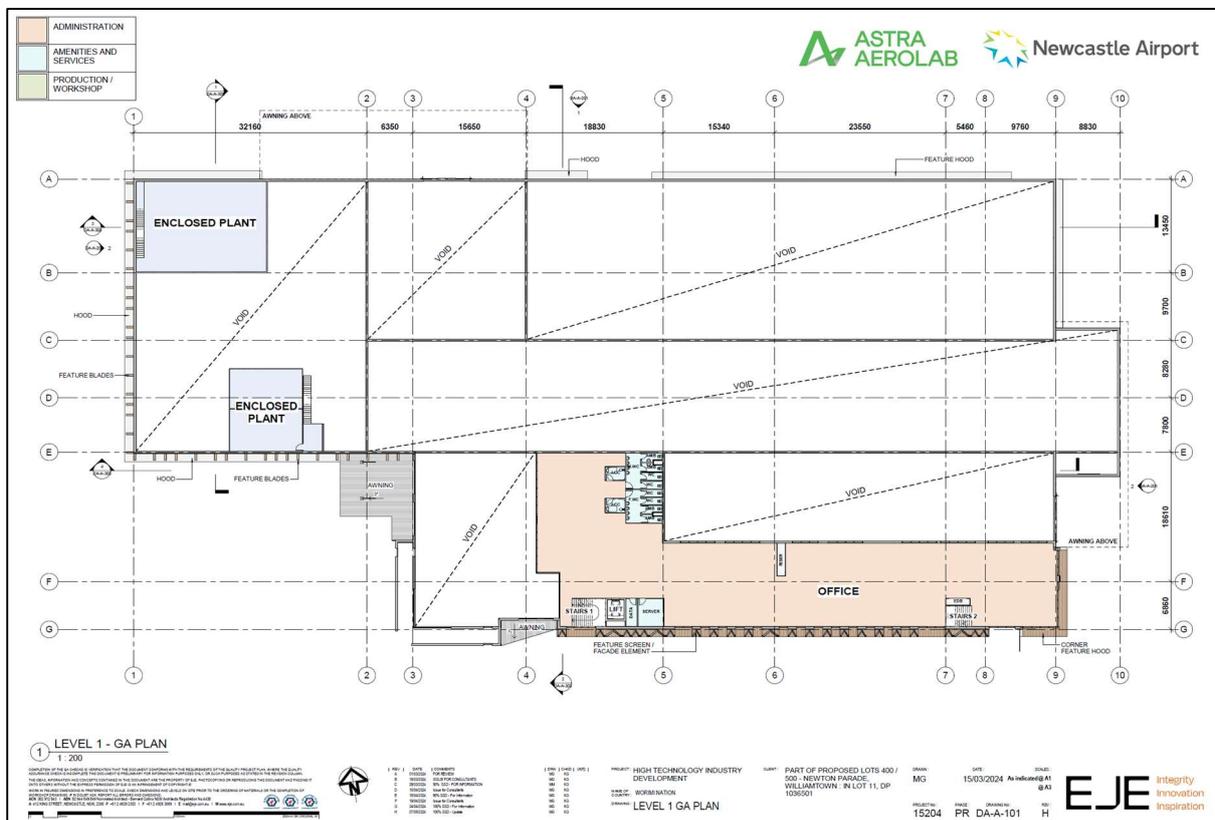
First Floor Plan. Source: EJE Architecture (May 2024)
